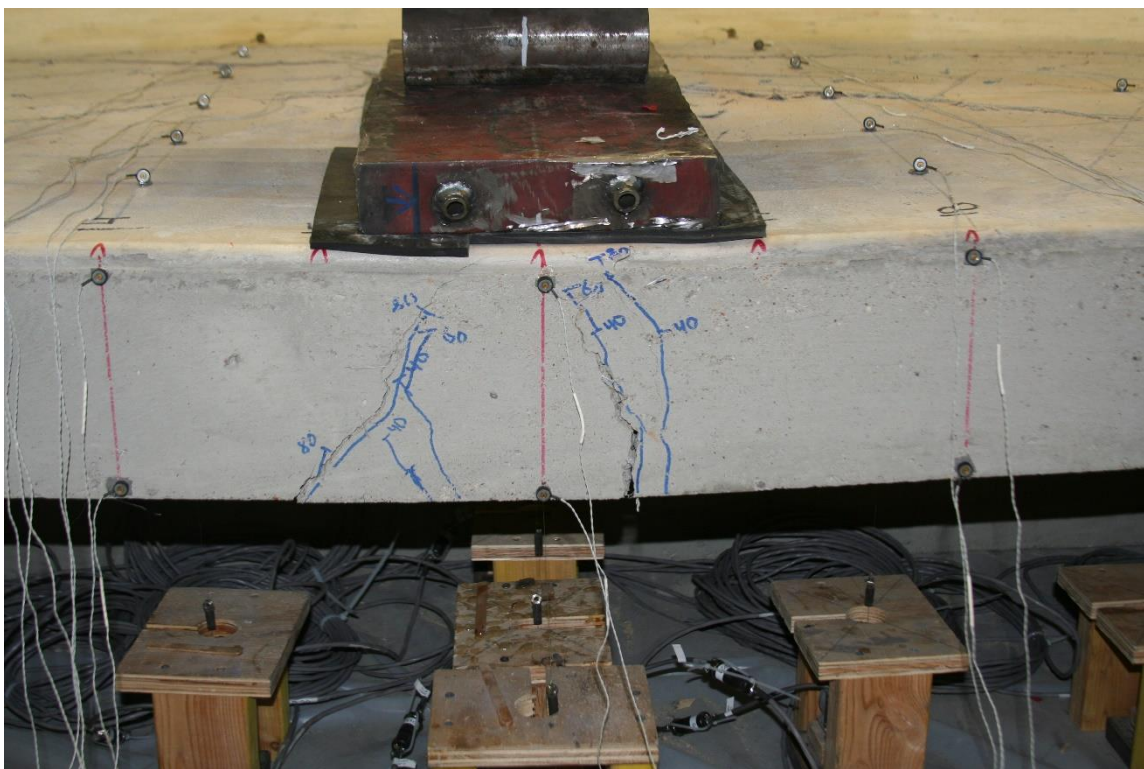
Cracks Beneath Load Point on Edge of Deck - LP3
